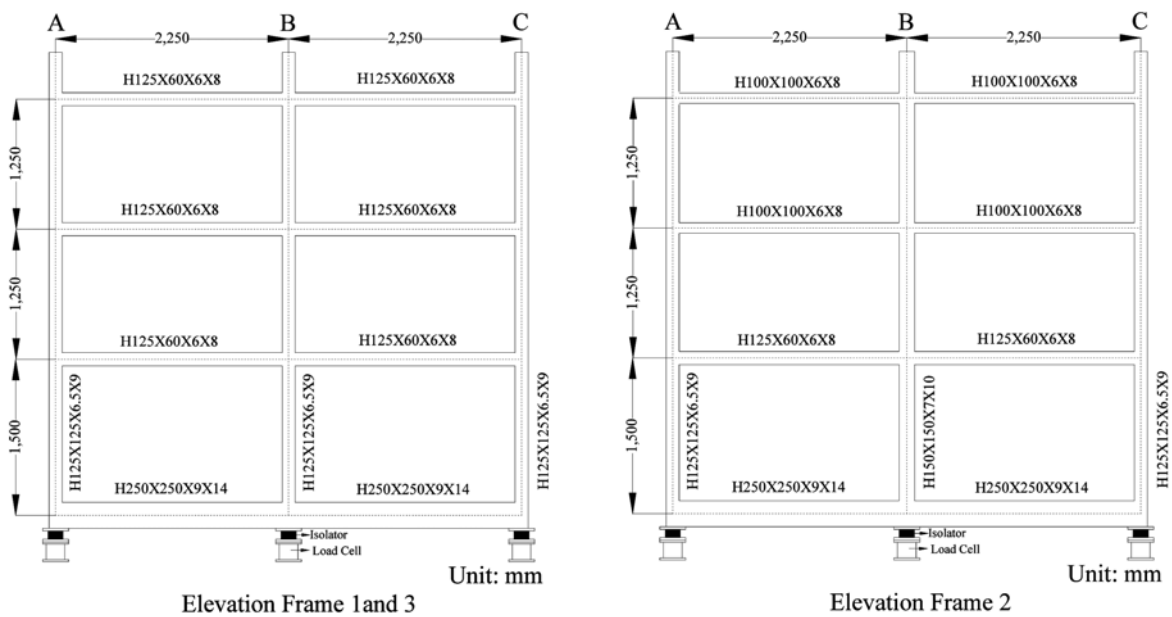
Longitudinal direction elevation of test base-isolated structure
